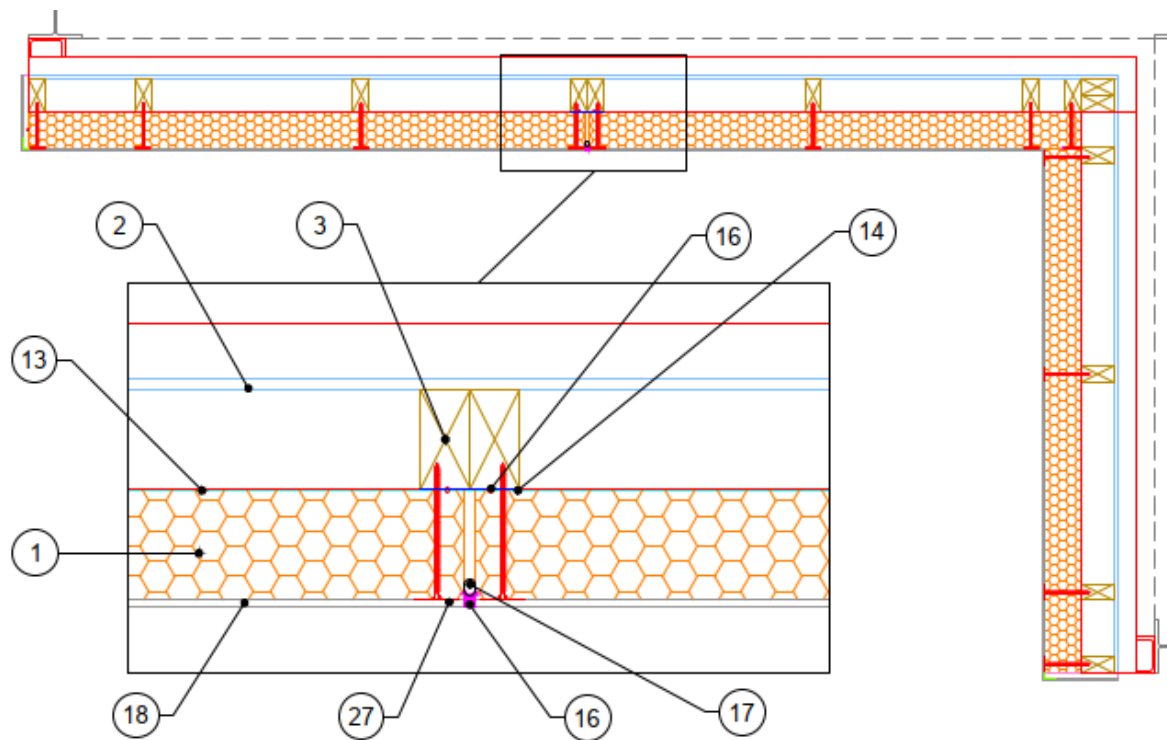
Cross-section B-B (Vertical construction control joint detail)
